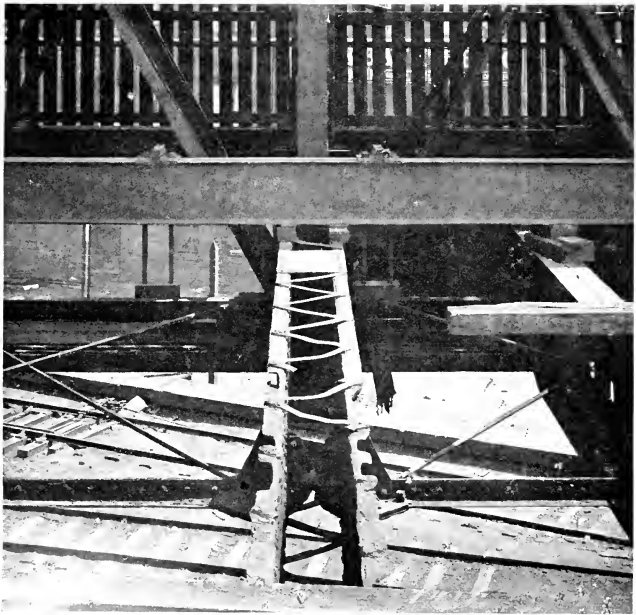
BOYLSTON STREET BRIDGE FLOOR BEAM OF ORIGINAL BRIDGE, CORRODED AND BROKEN.
